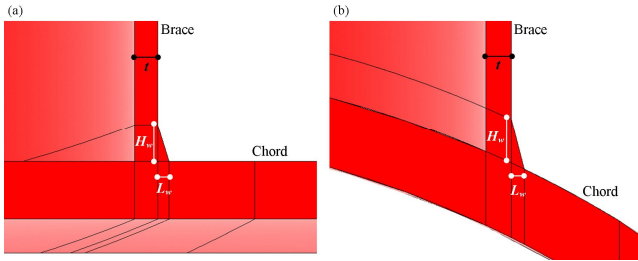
Weld dimensions: (a) Crown position, (b) Saddle position
